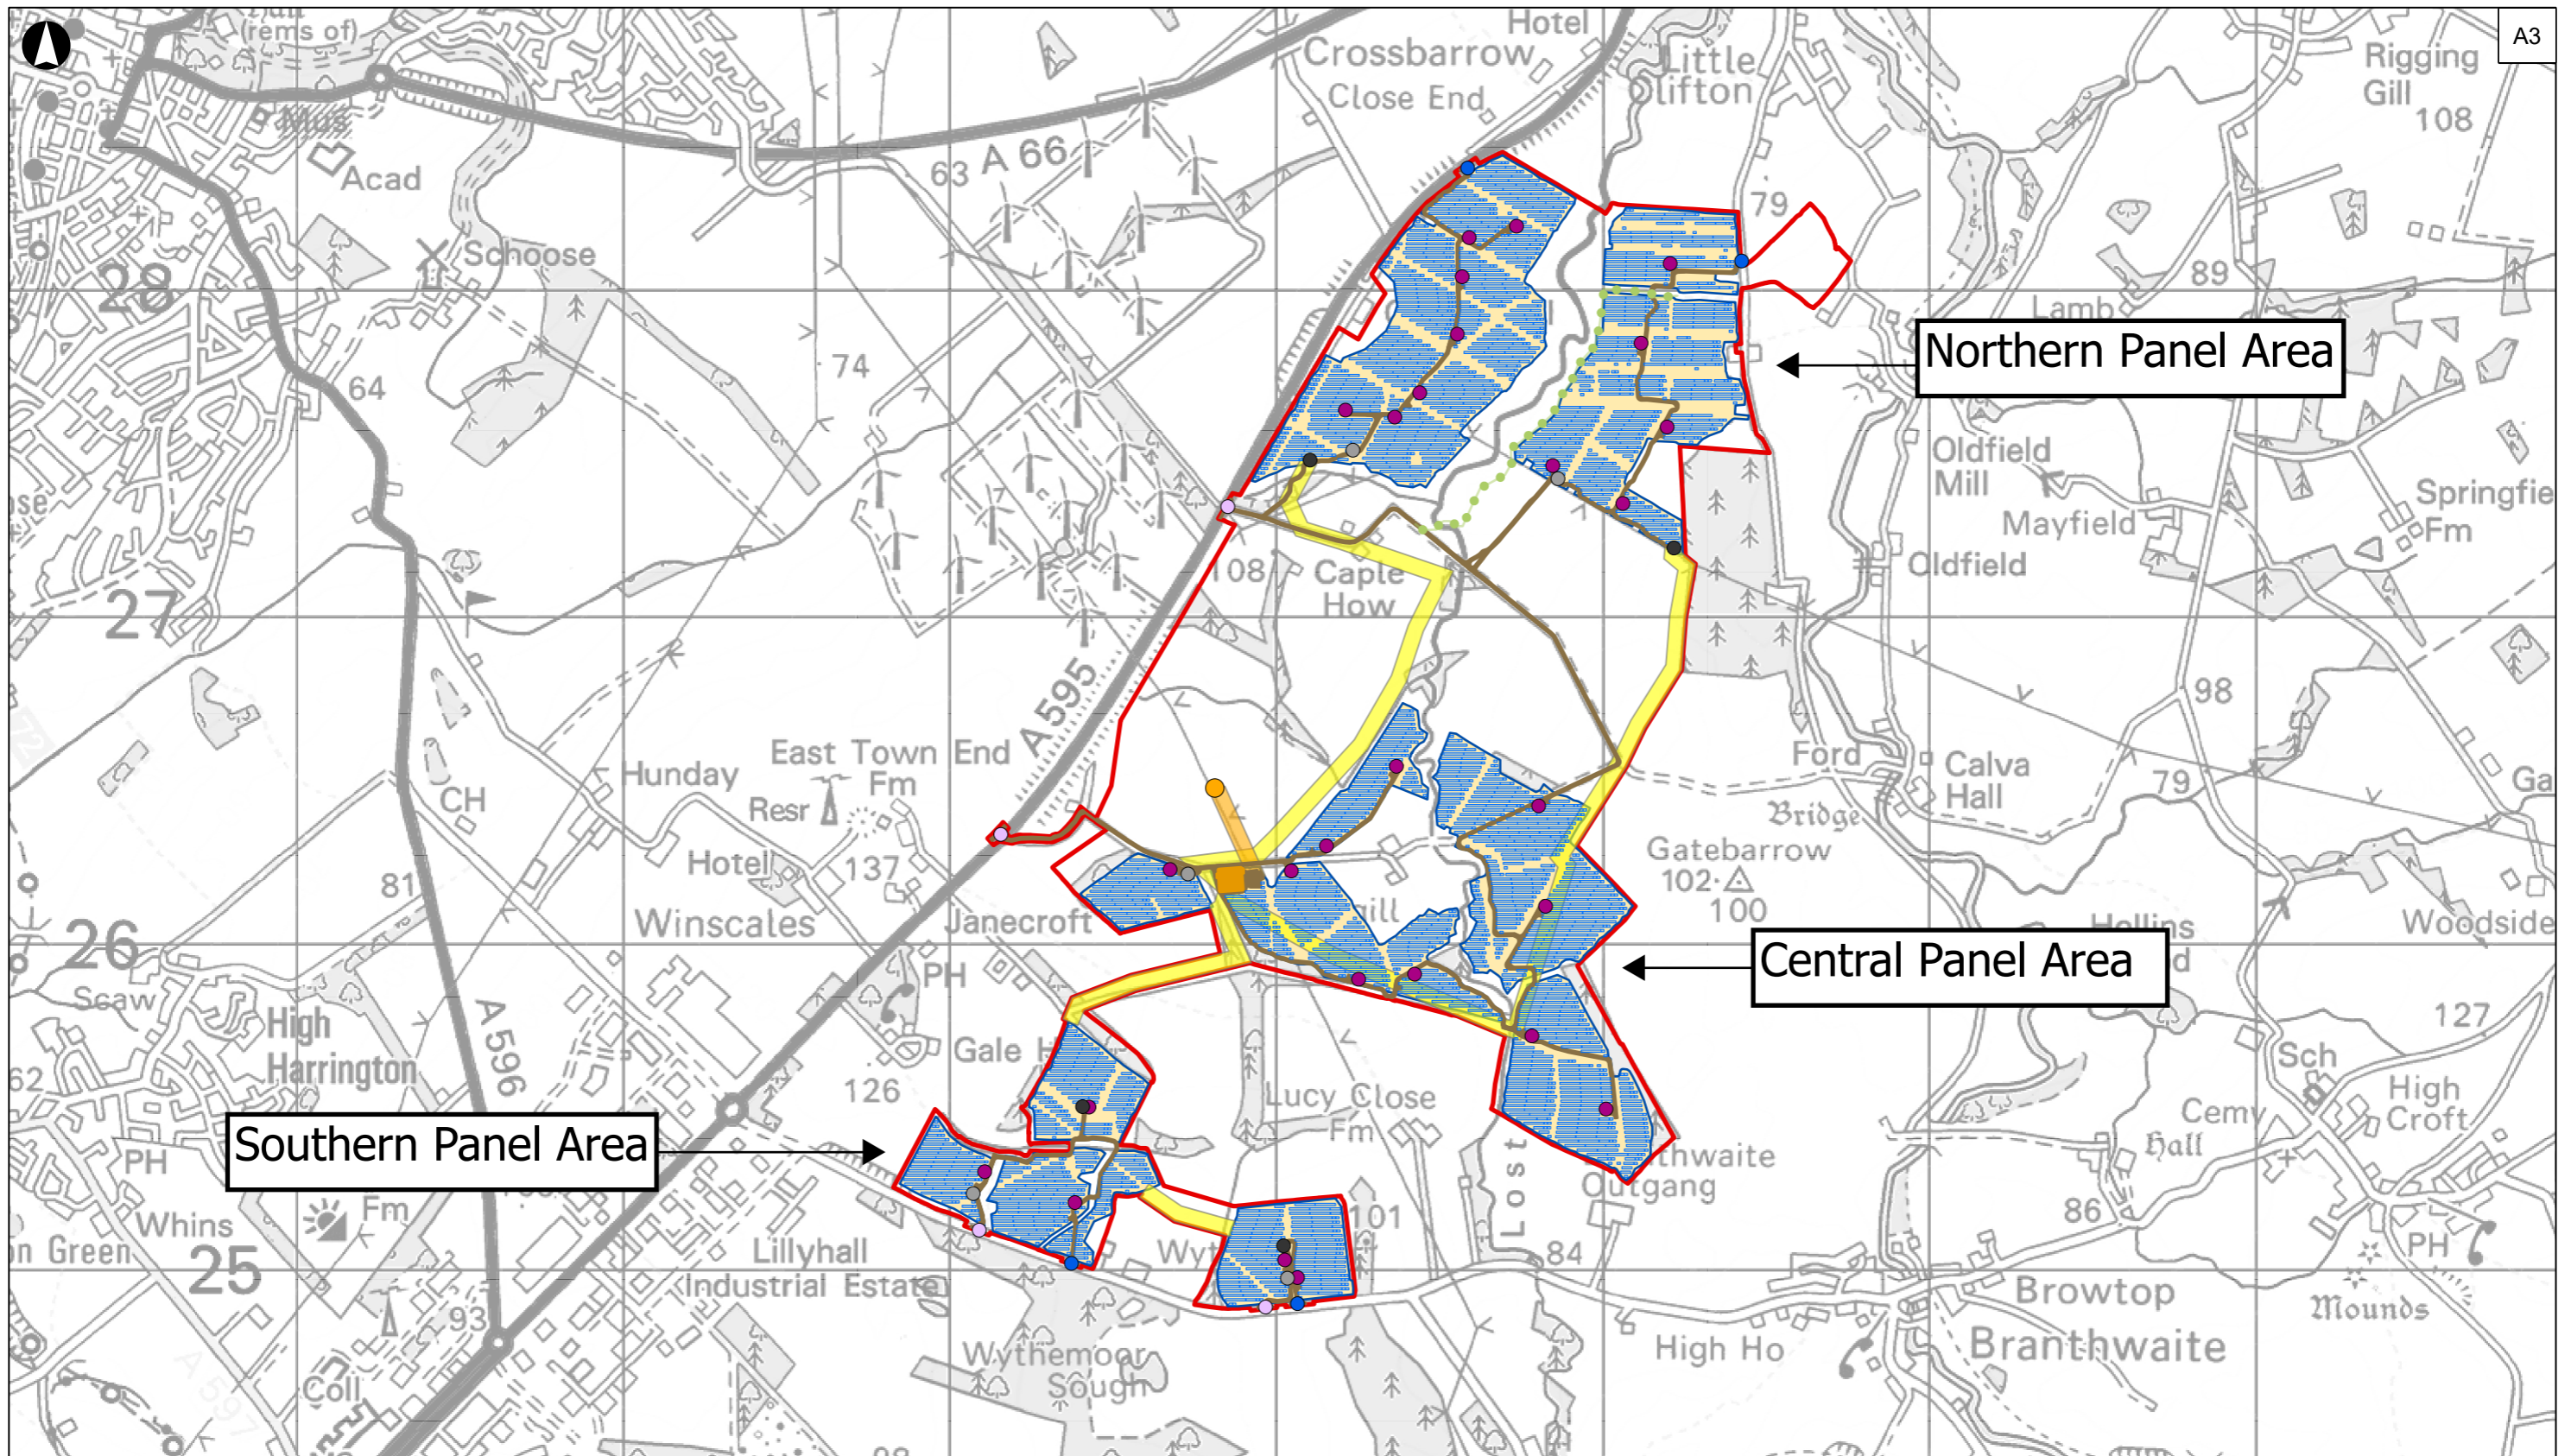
PEIR Figure 1.2 Layout of Proposed Development
